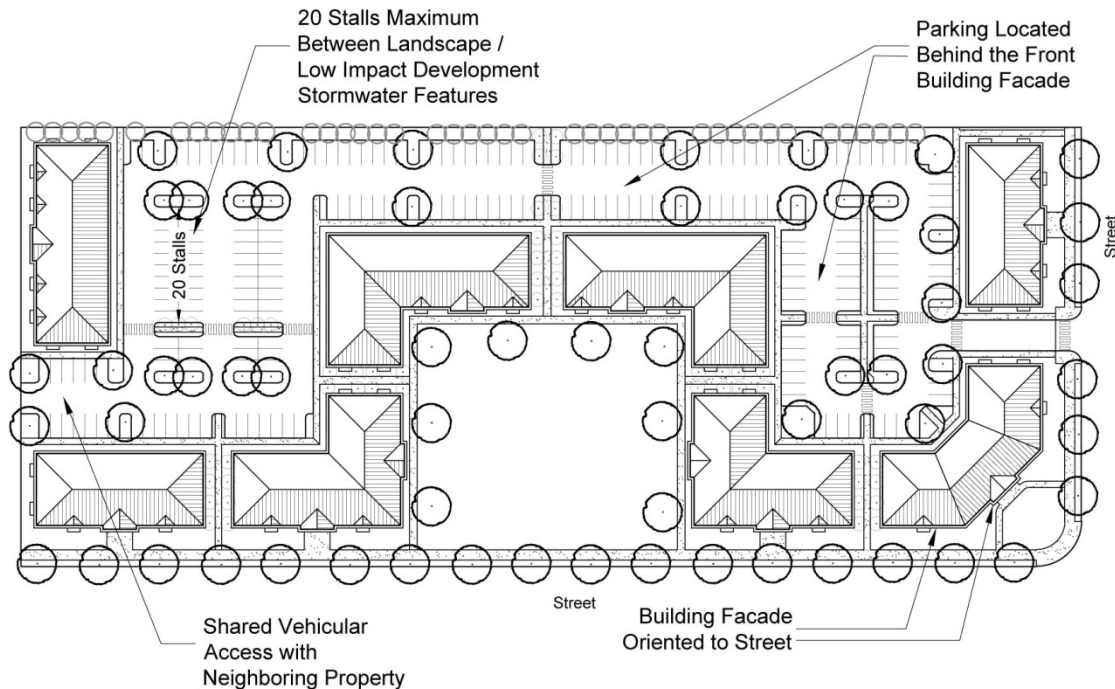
(d),3- Site Layout – Parking Lot Standards
